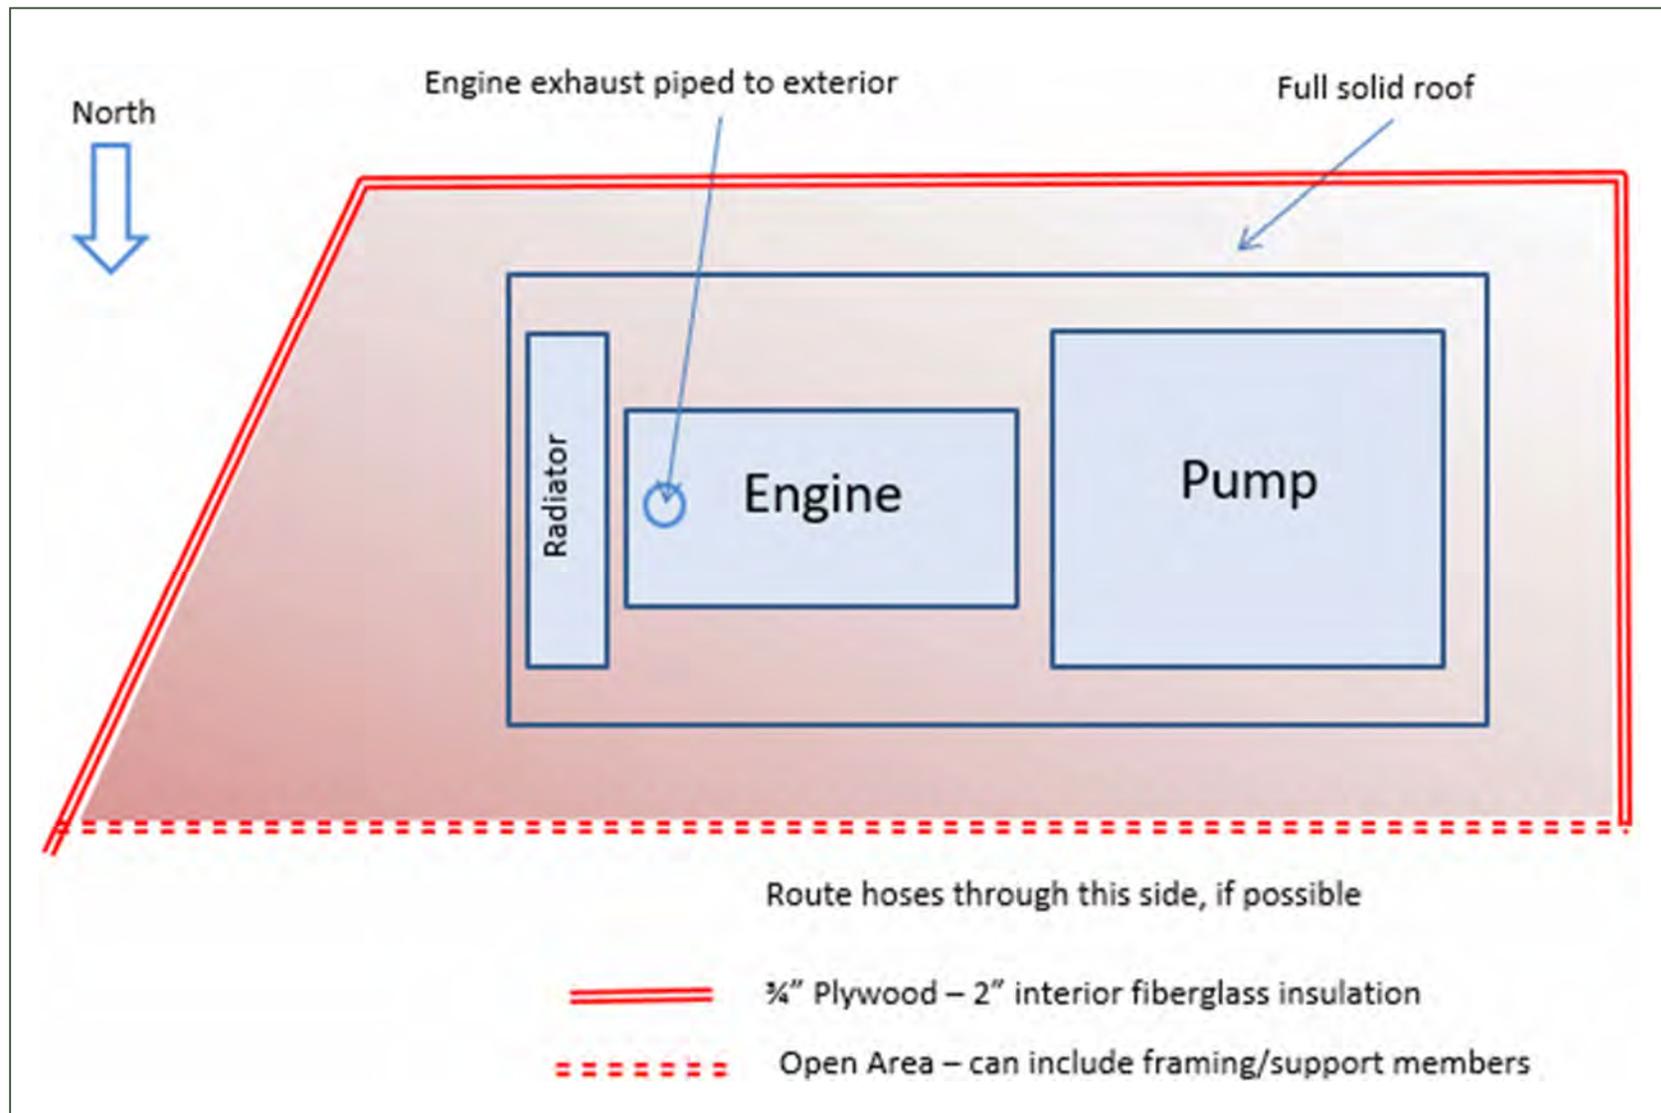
Typical Enclosure Layout for Diesel Powered Pump or Welder Equipment Axis Oriented East/West
